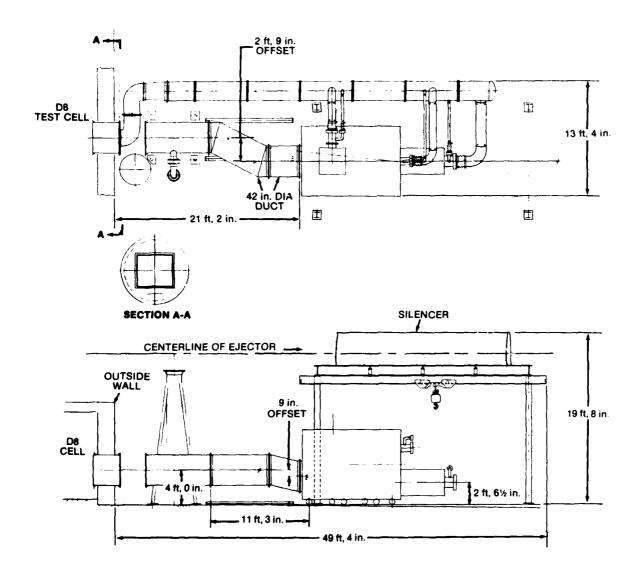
Area Arrangement of Altitude Facility and Test Equipment.
